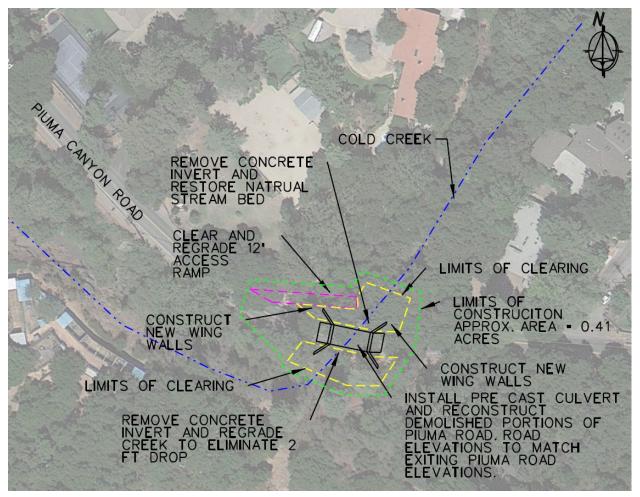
CC1, Piuma Culvert Schematic Design Part B
